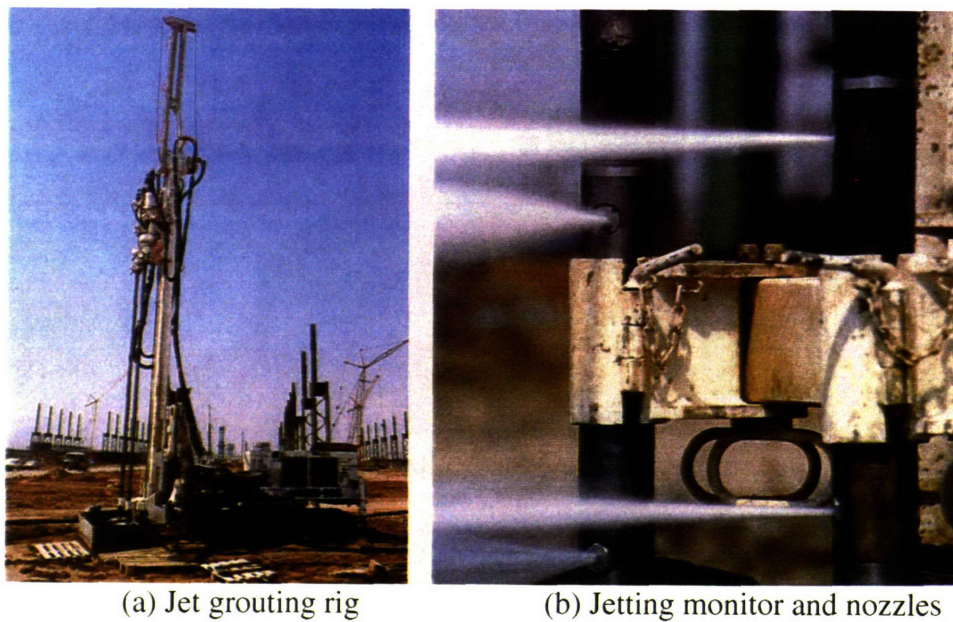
Jet grouting equipment (Trevi brochure, www.trevispa.com)
